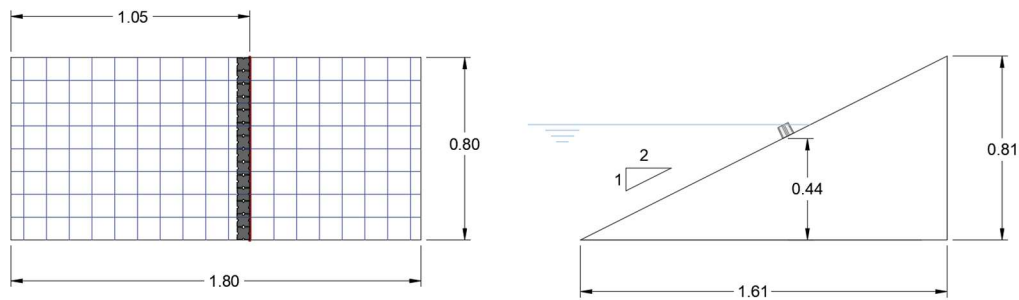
Perpendicular view (left) and profile view (right) of Antifer blocks arrangement for series 05 and 06.
